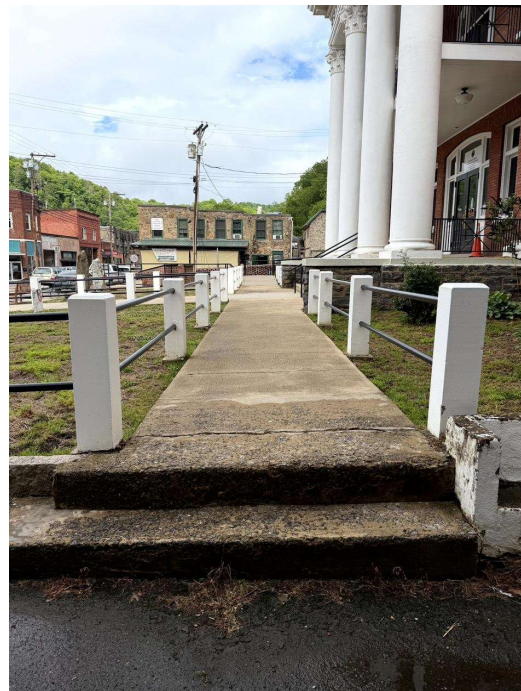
(right): view along the entrance plaza perimeter showing the concrete-post and metal pipe railing fence, wrought-iron benches, and deteriorated stone curb edge at the sidewalk.
